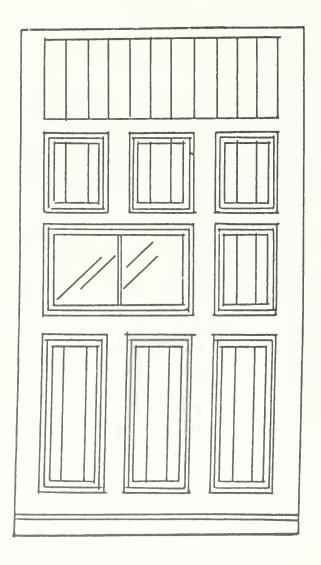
Polish Club building: Conjectural appearance of secondary recessed entrance's east wall, 1909.
